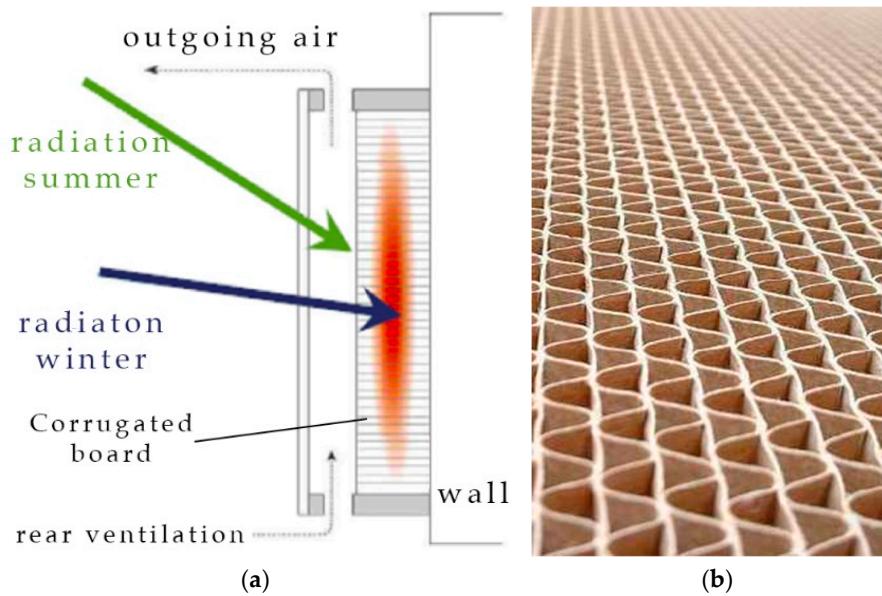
(a): Detail of MAFa construction [55]. (b): Detailed view of the corrugated board [55].
